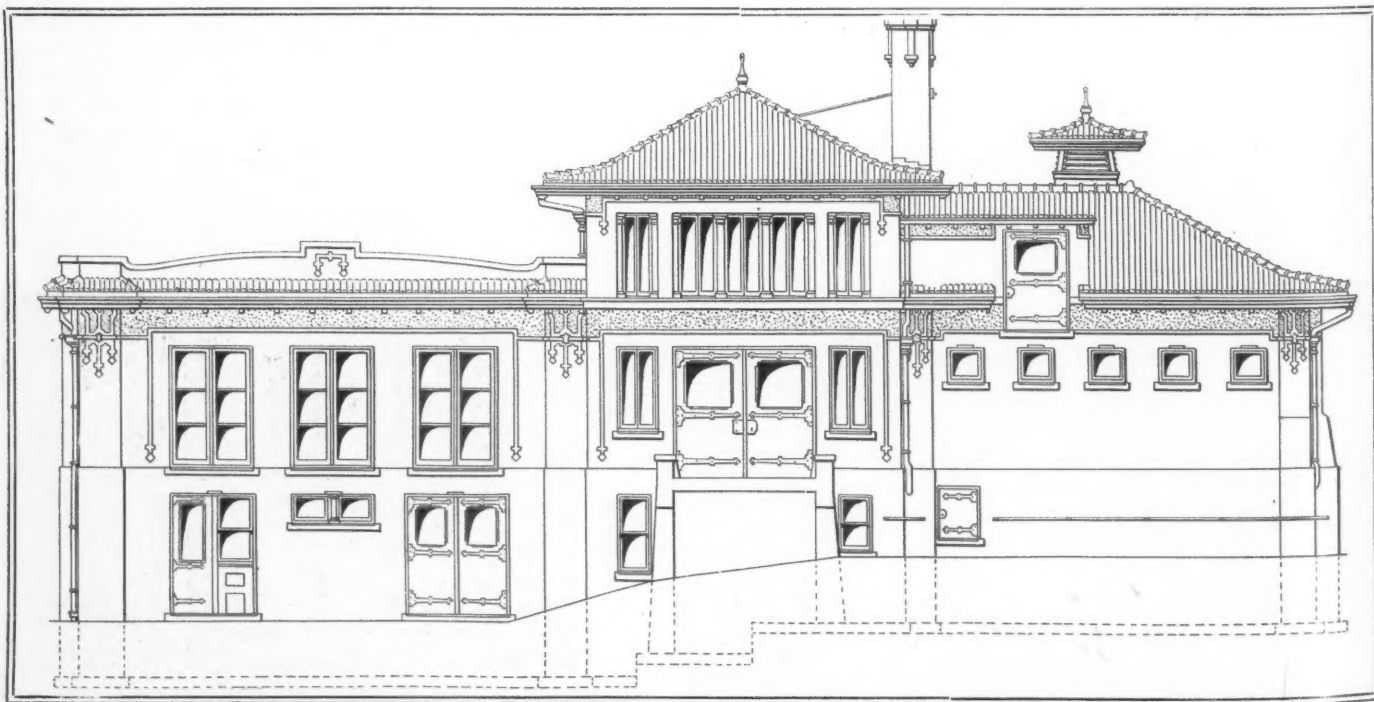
FRONT ELEVATION OF THE NORRIS COMBINATION GARAGE AND STABLES
